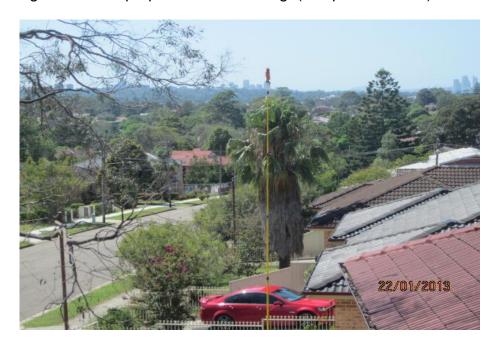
View to the east (with Height Pole showing proposed ridgeline of new dwelling at the front of the dwelling)
